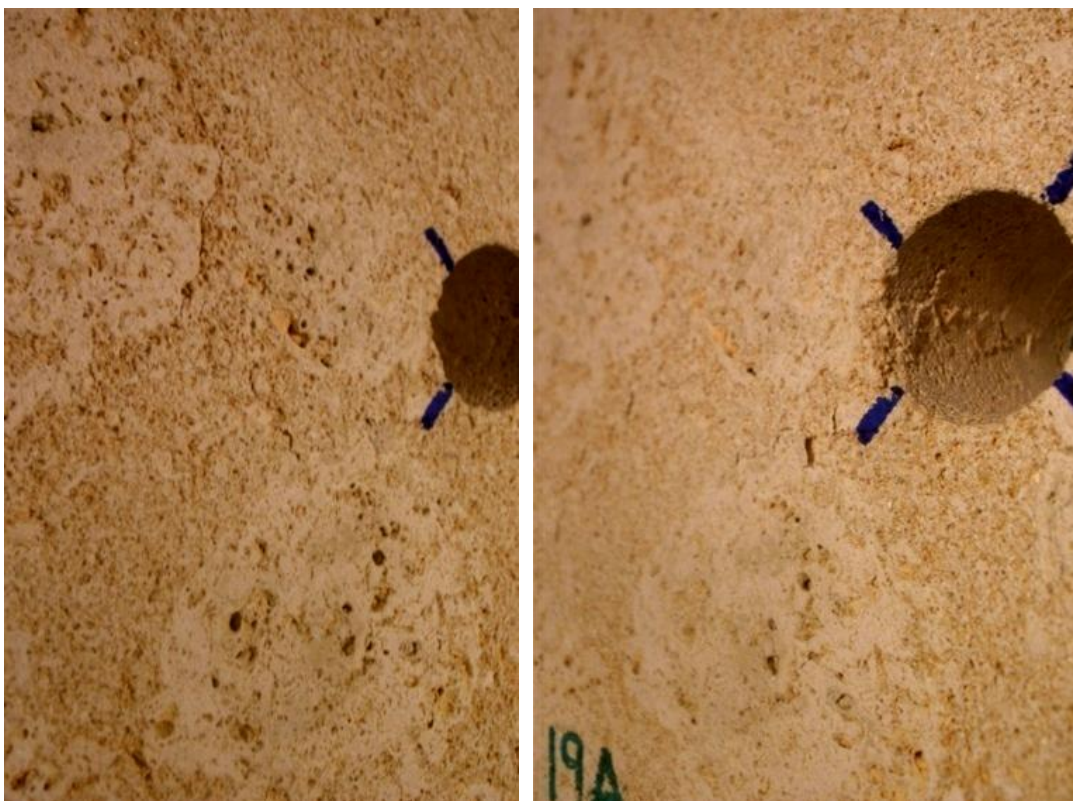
Cracks in specimen 19 for point 7 of the figure 5.23. Cracks on the side A of the specimen.
